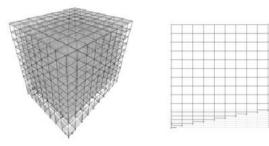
3-D View and elevation of a step back building for storey 9 (10° Slope)
